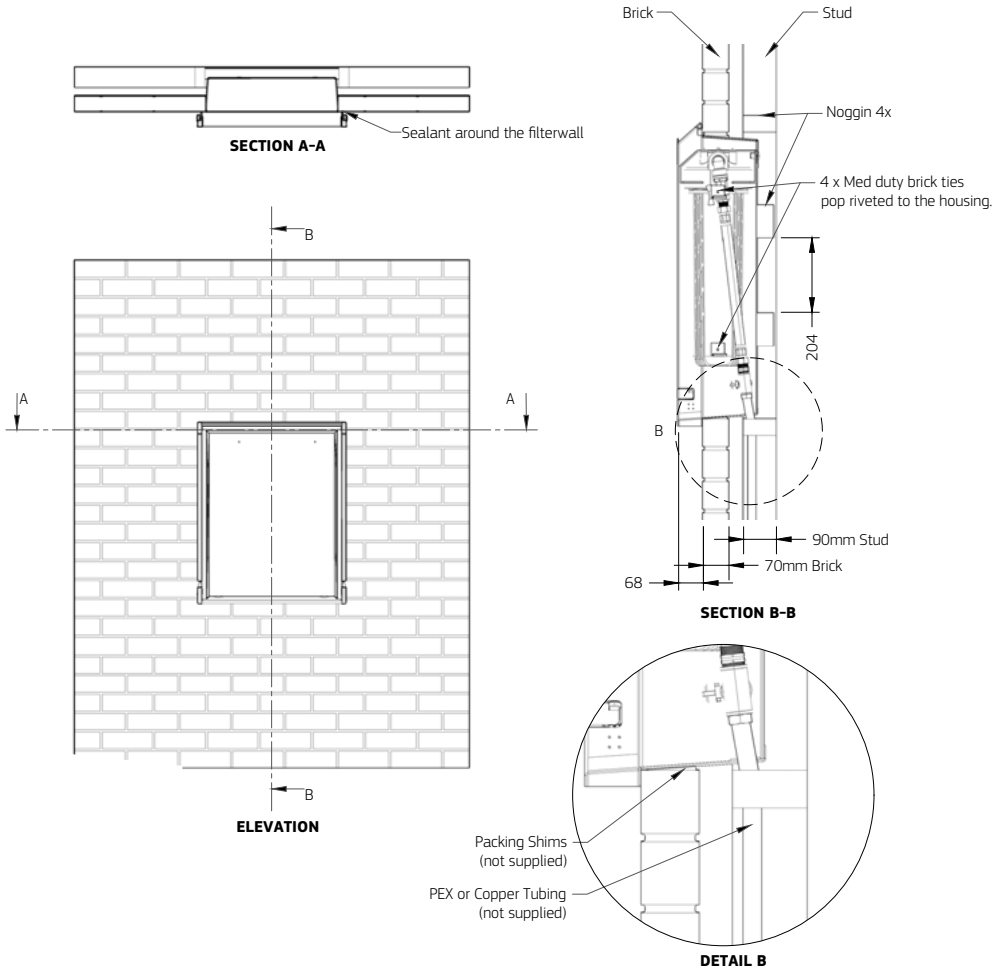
Builder Plans for 70mm Brick, Brick Tie
